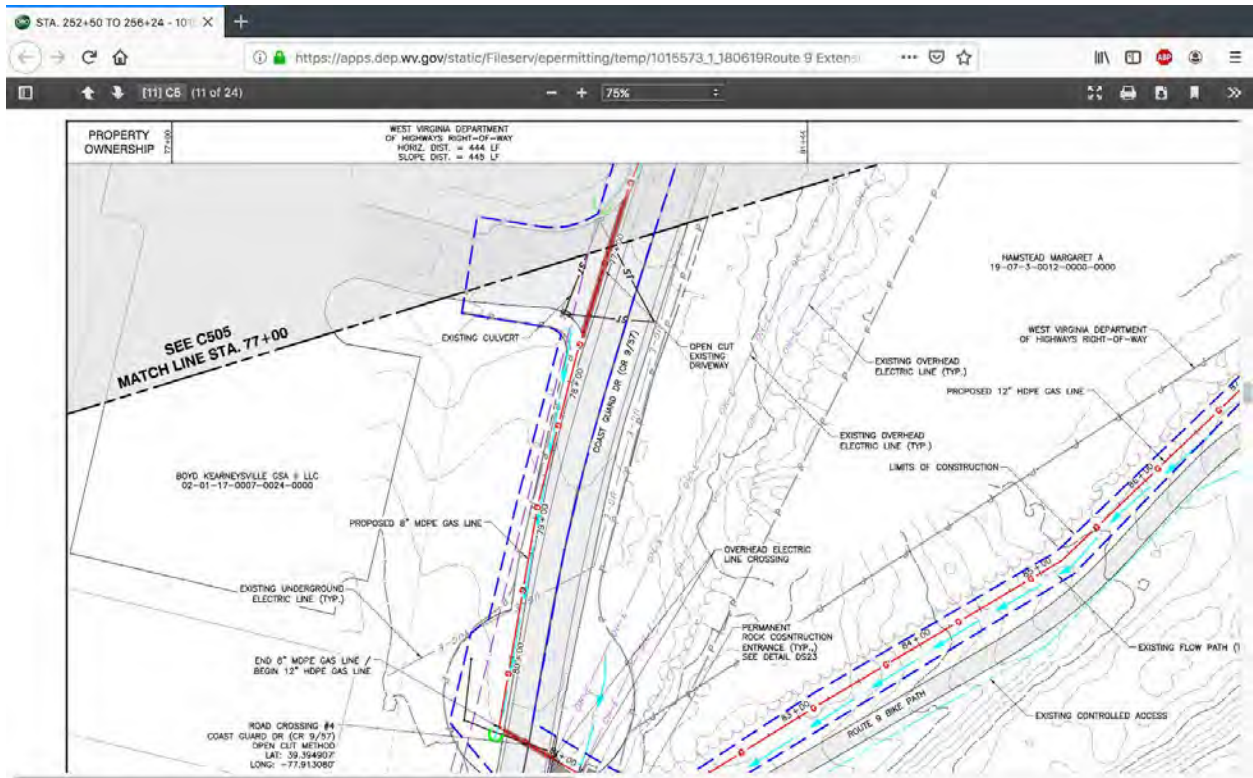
LONGITUDINAL INSTALLATION OF MOUNTAINEER GAS PIPELINE IN THE DOH ROW ALONG GOOD FOLKS ROAD
